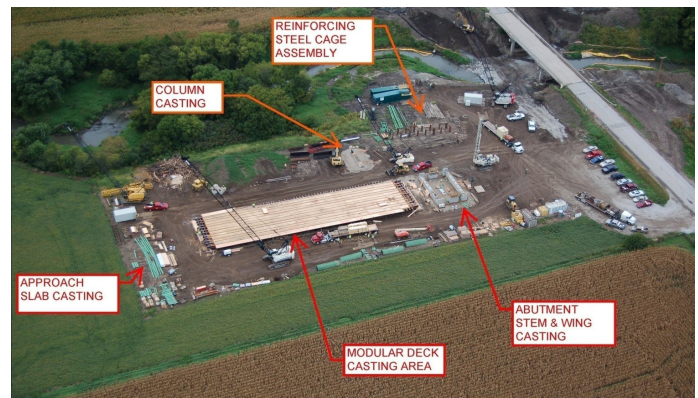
KEG CREEK BRIDGE REPLACEMENT, COUNCIL BLUFFS, IOWA. PREFABRICATED BRIDGE ELEMENTS WERE FABRICATED OFF-SITE. SOURCE: IOWA DEPARTMENT OF TRANSPORTATION
